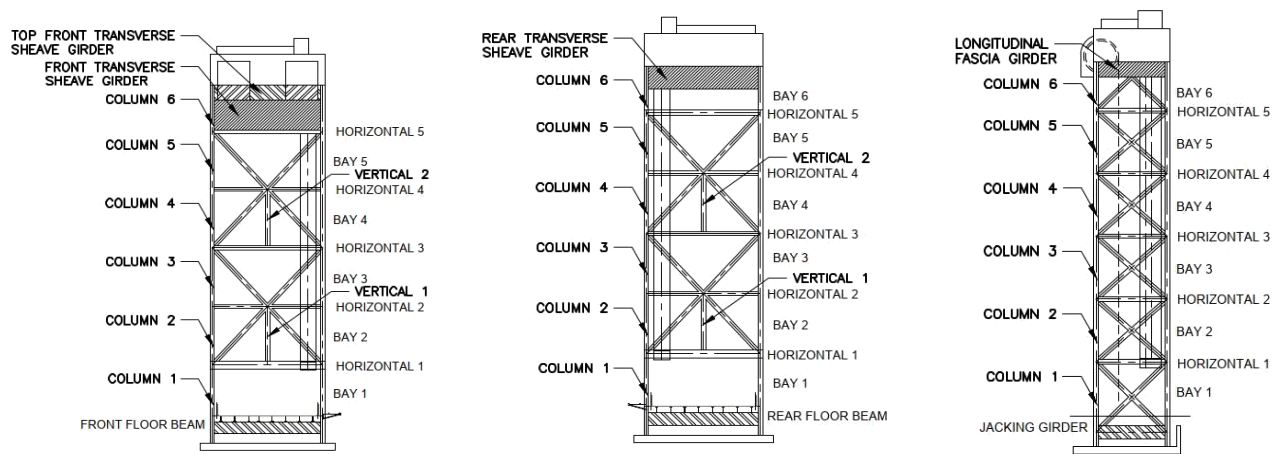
Concrete Floor Load Applied to Sheave Girders
